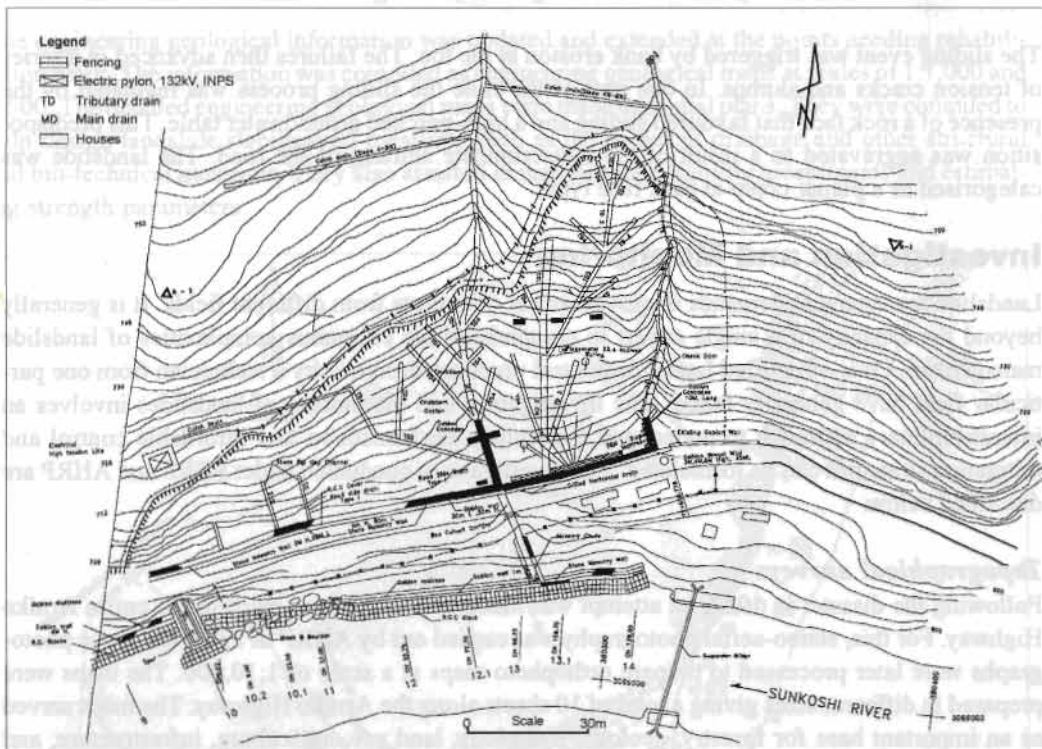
Plan of landslide AH-4 (RFRP 1990)
